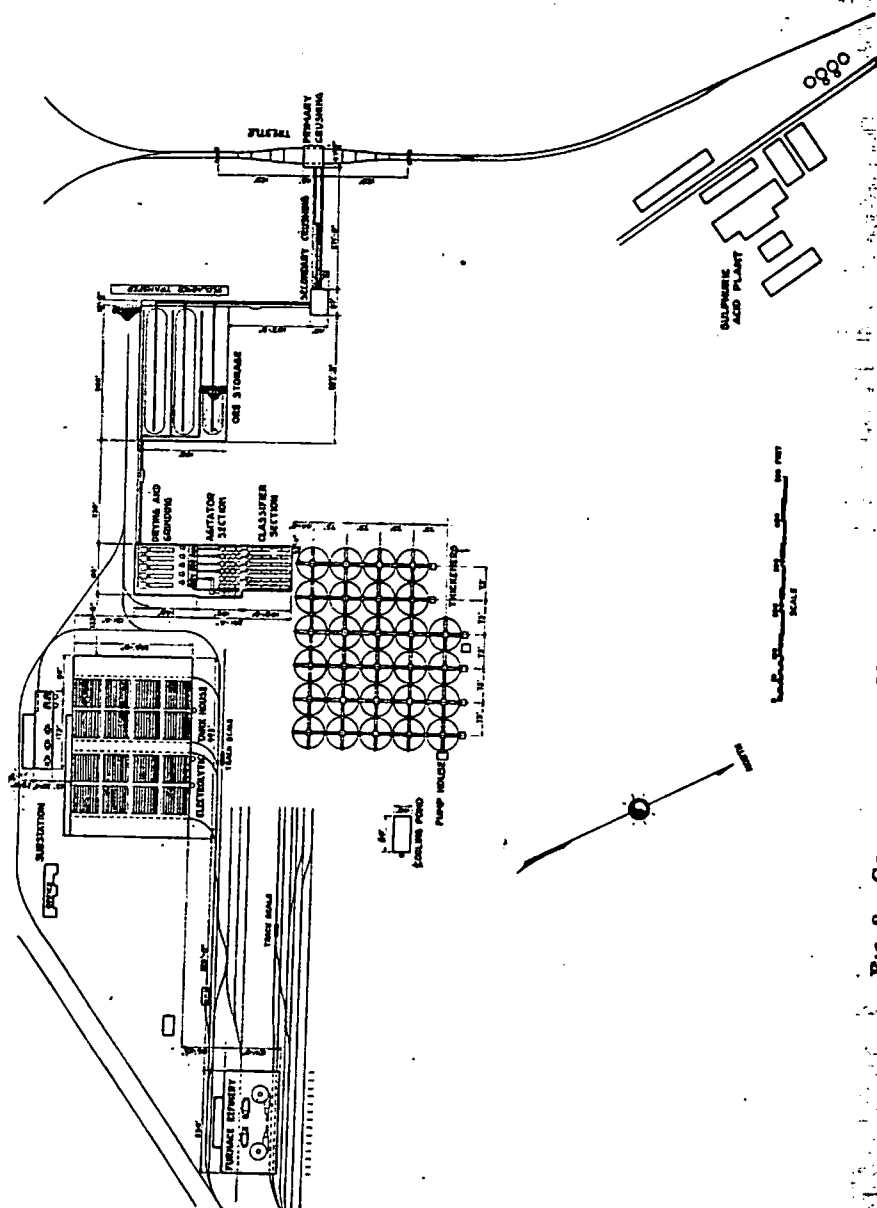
GENERAL PLAN OF 30,000-METRIC-TON PANDA LEACHING PLANT.
